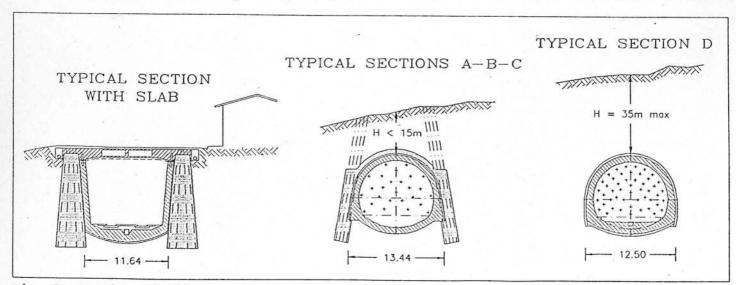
Poggio Orlandi Tunnel: typical sections.
